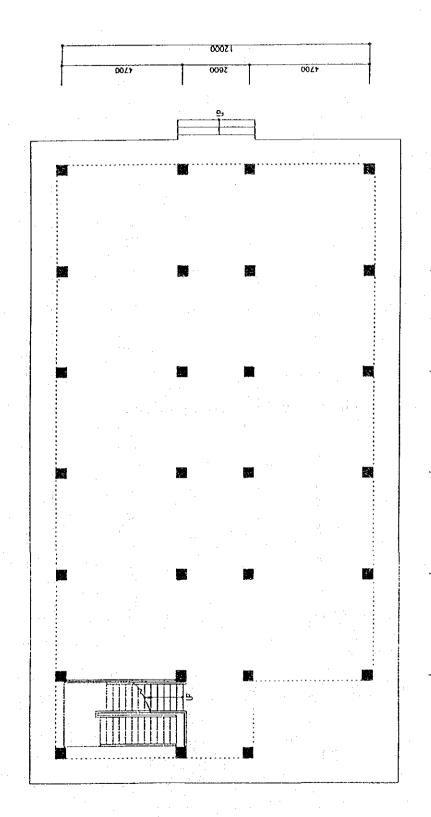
(1) GROUND FLOOR PLAN (3-CLASSROOM TYPE)
